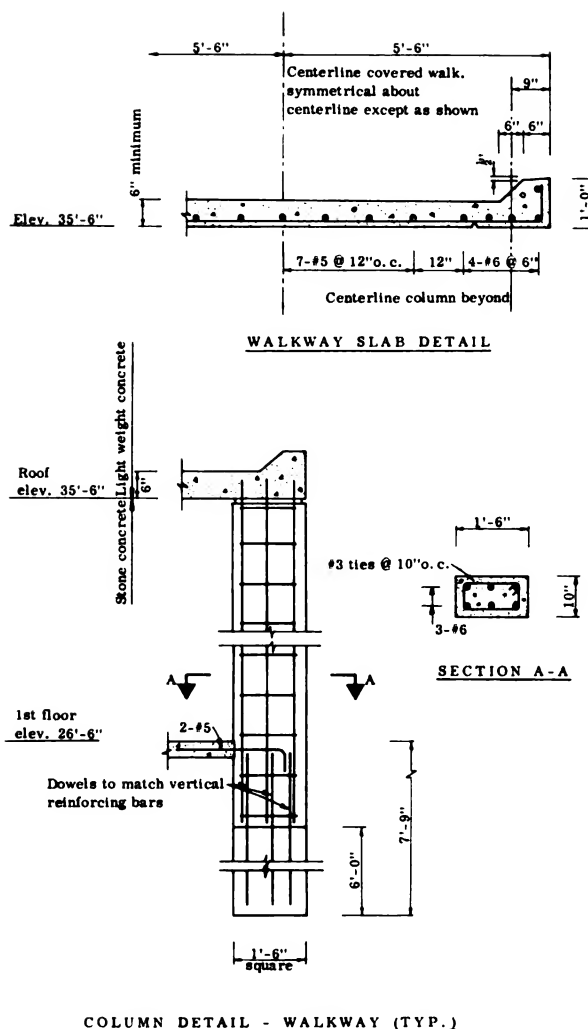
Olive View Hospital, walkway canopy. Details of column and roof connections.
